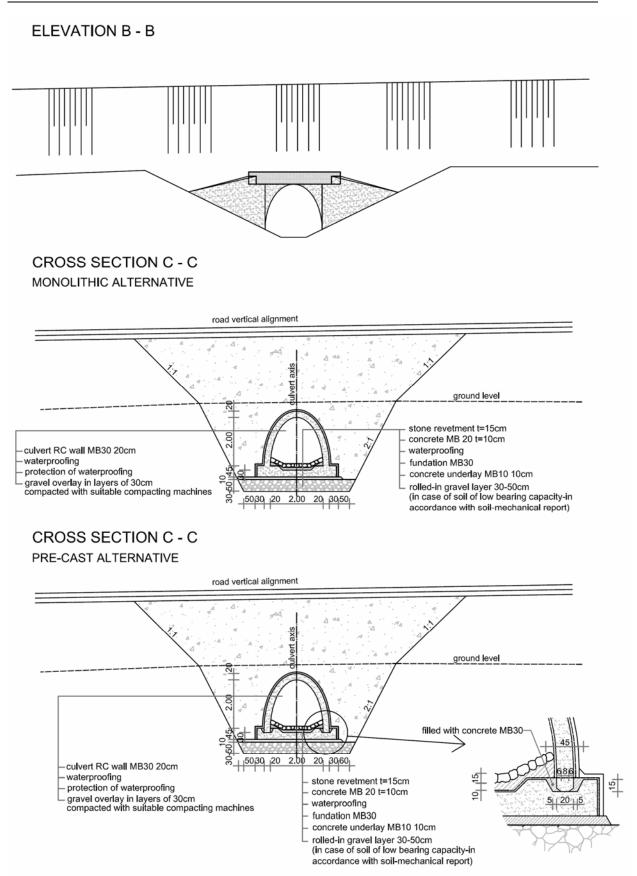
Elevation B-B, cross section C-C for monolithic and pre-cast execution of arch culvert shown in figure 6.6 including detail of joint pre-cast arch – bottom slab
